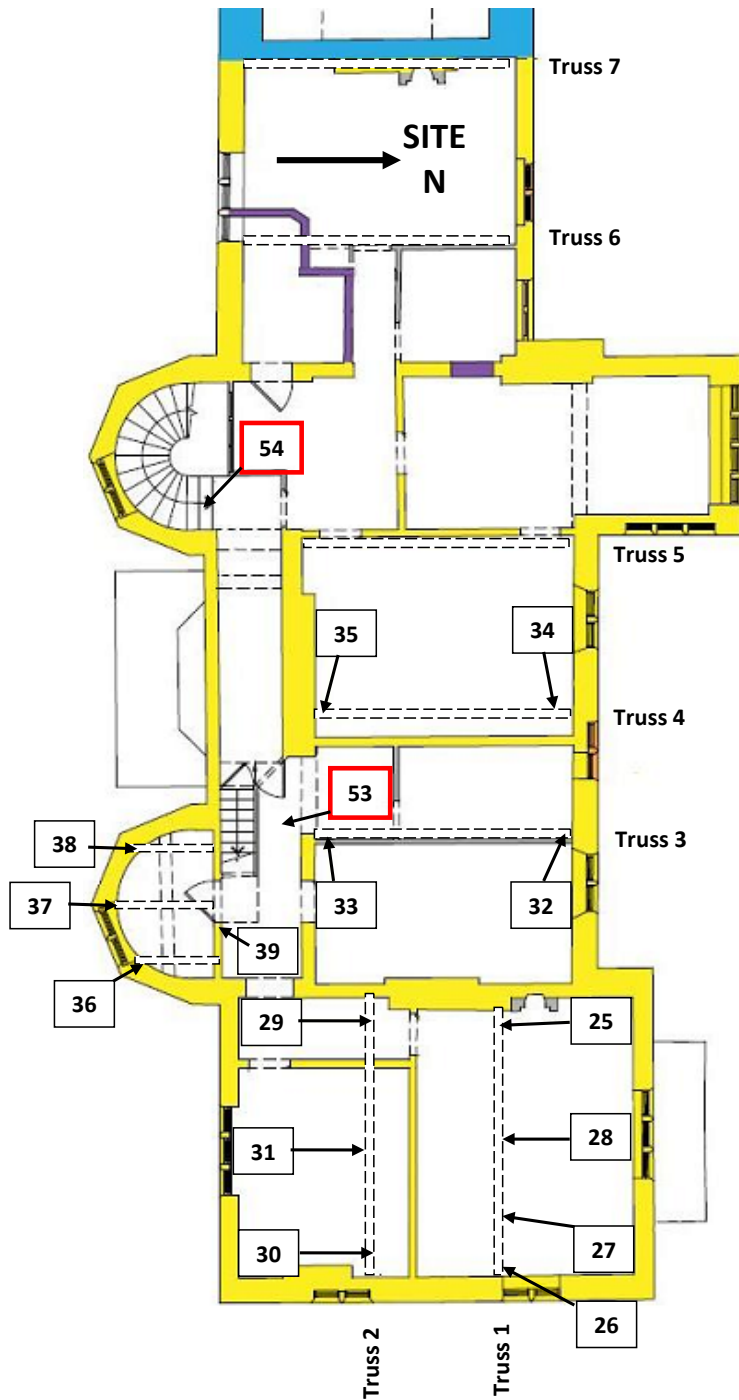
Second-floor plan of the hall range to locate sampled timbers (after Worcestershire Archaeology 2019)
